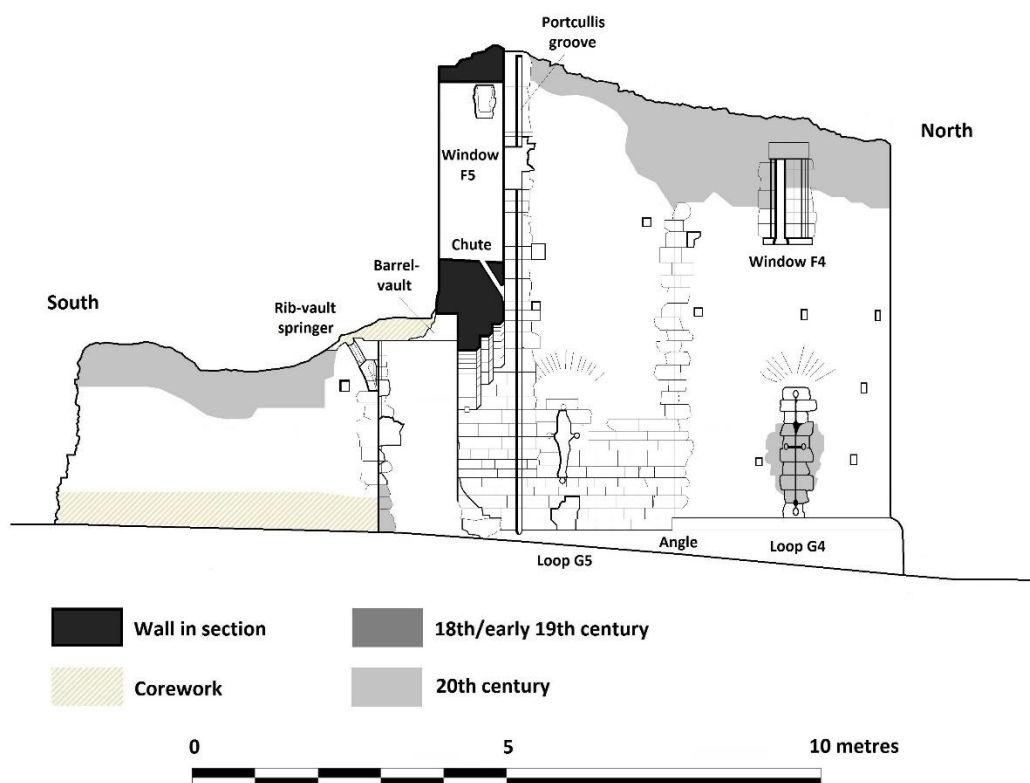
Leybourne Castle gatehouse, west tower – west-facing section
